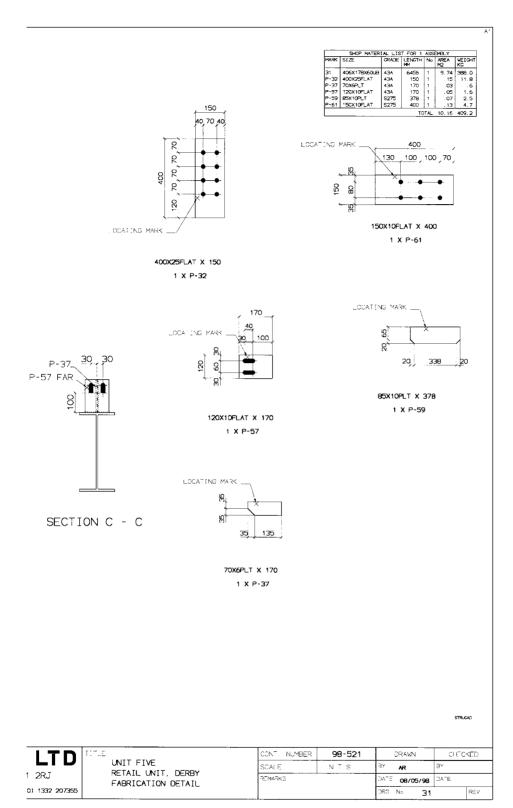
Typical fabrication details for a beam (Strucad, Derby, UK)
